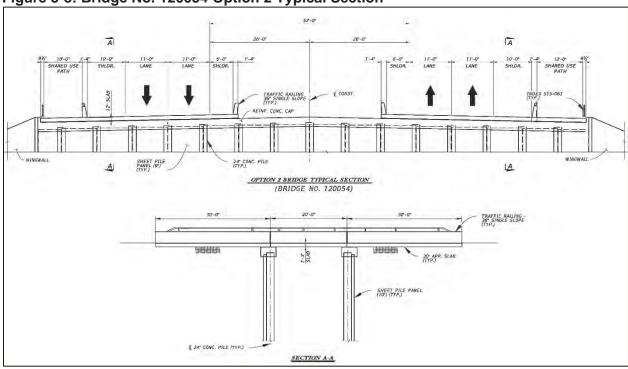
Bridge No. 120054 Option 2 Typical Section
